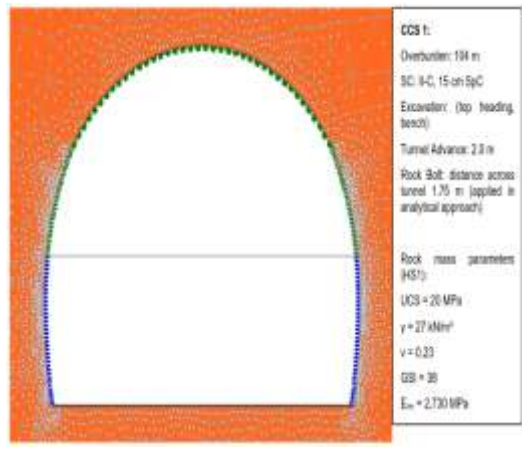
Calculation cross-section 1, 104 m OB, SC: II-C
